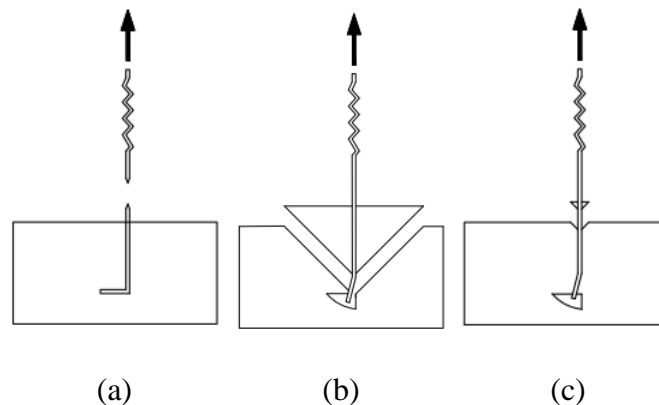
Failure modes in Tension of a cavity wall tie connection: Tie failure(a), Cone break-out failure (b) and pull-out failure (c).
